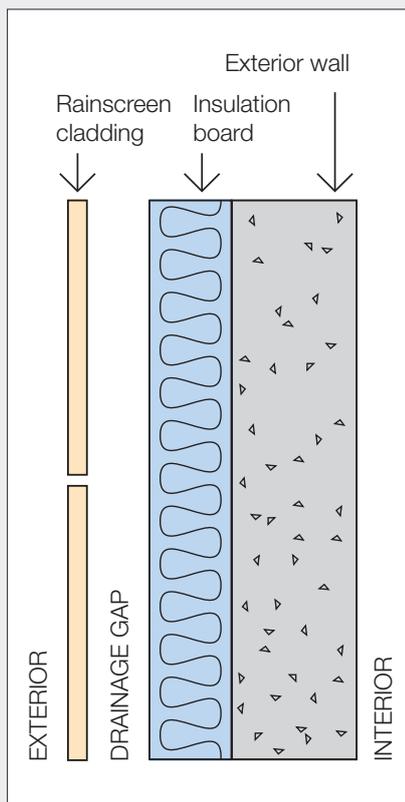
Simplified schematic diagram of an insulated rainscreen facade system (supporting frame for cladding and cavity barriers not depicted).
